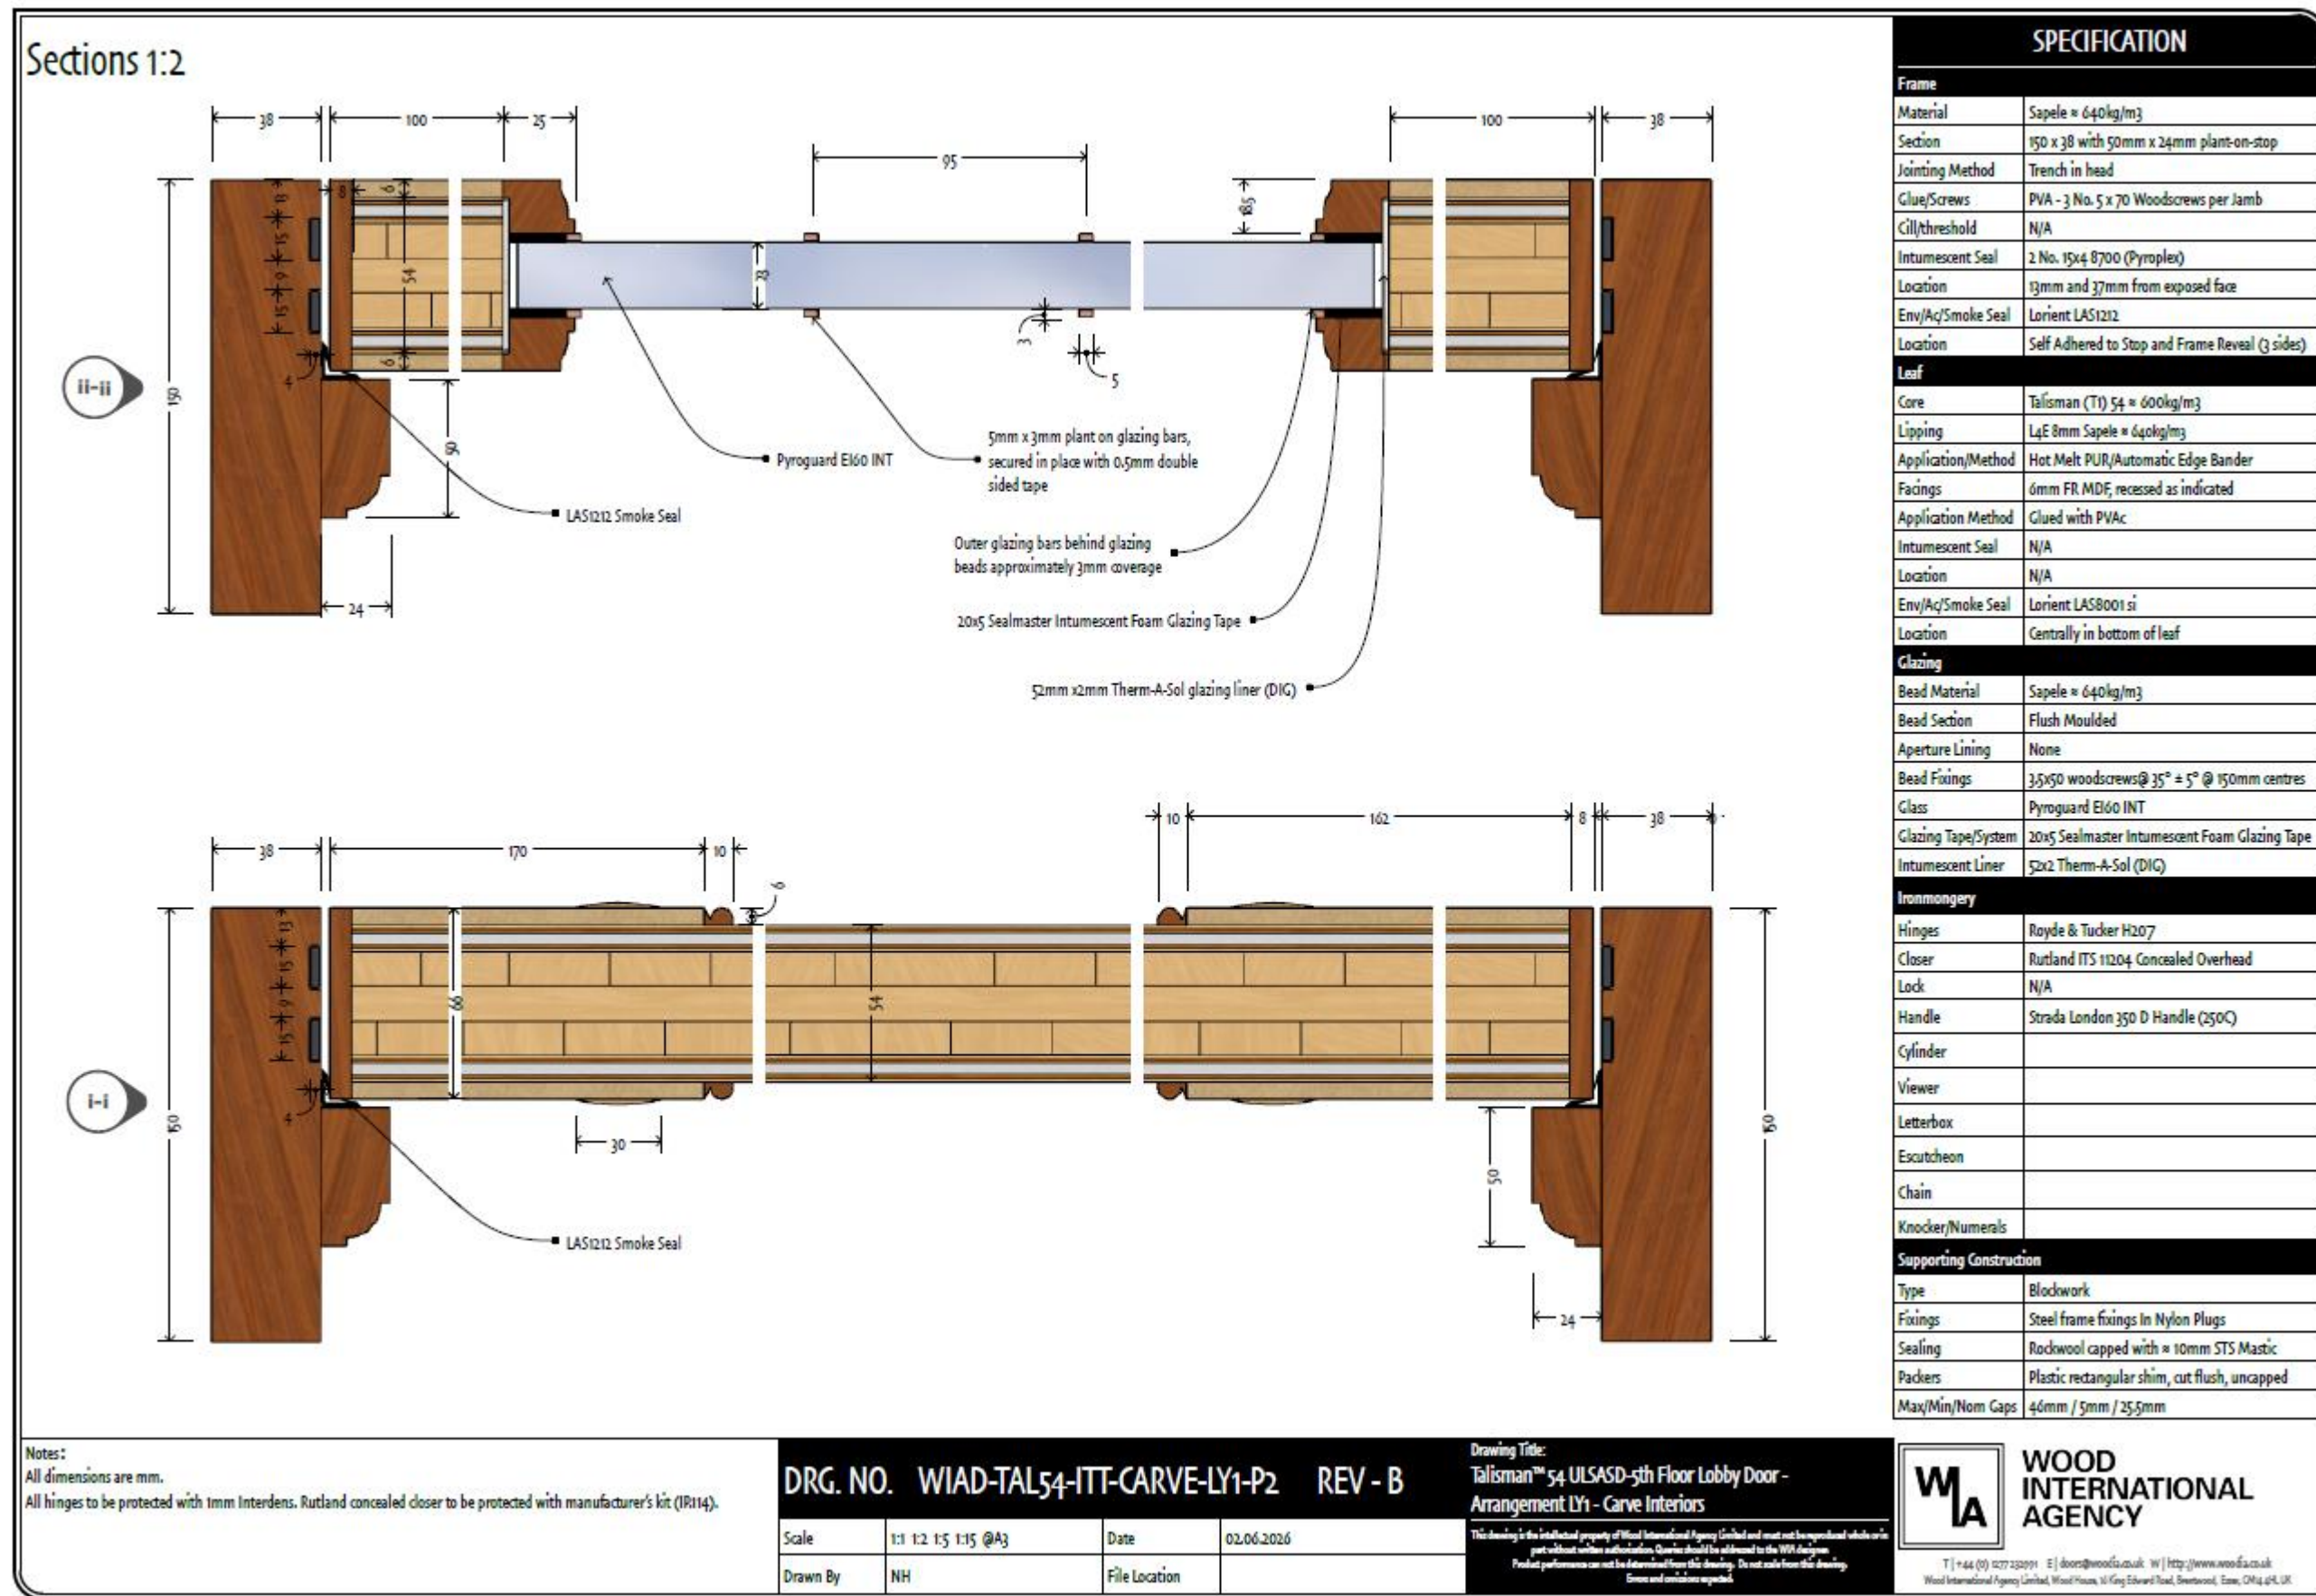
Doorset A - Drawing No. WIAD-TAL54-ITT-CARVE-LY1-P2 Page 2
